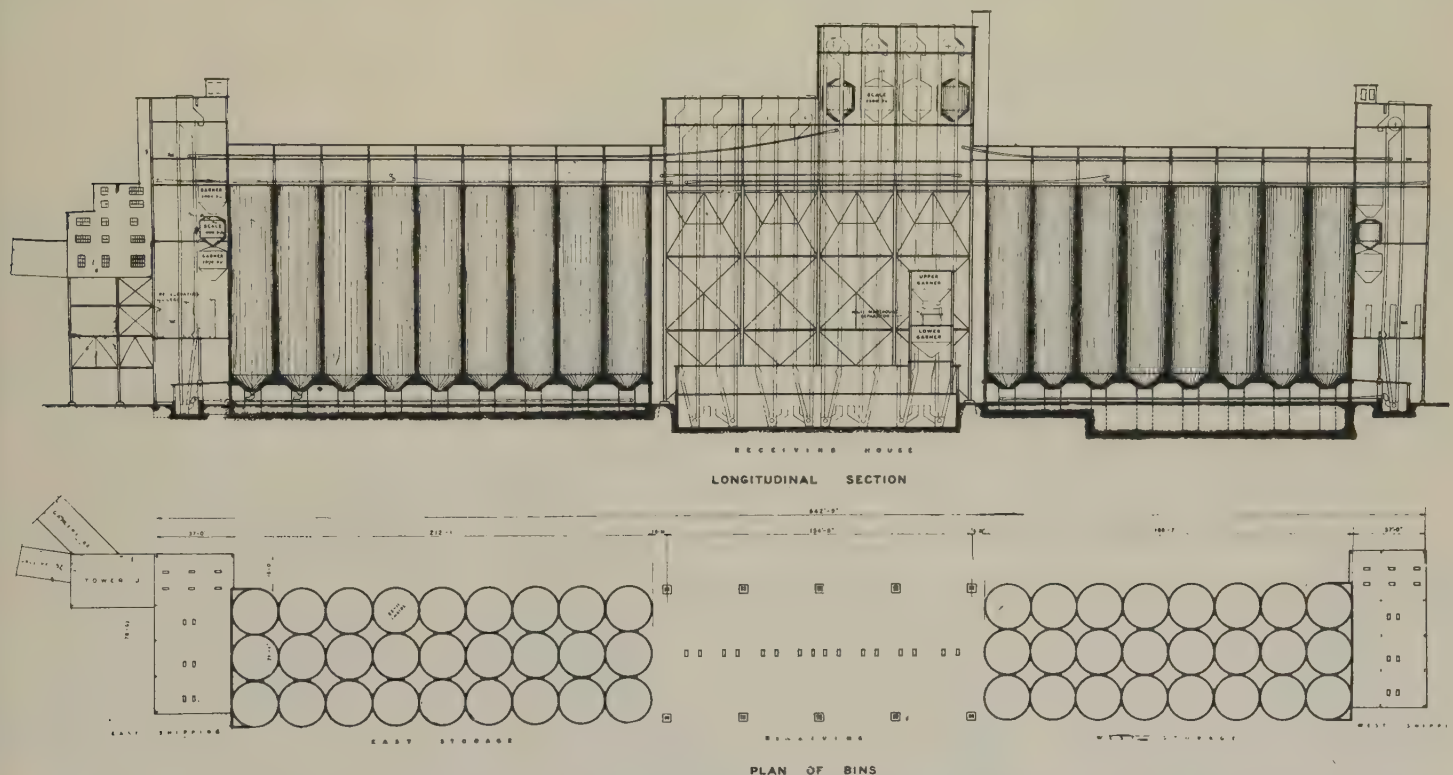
Longitudinal Section and Bin Plan Harbor Commissioners' Elevator No. 3, Montreal.
